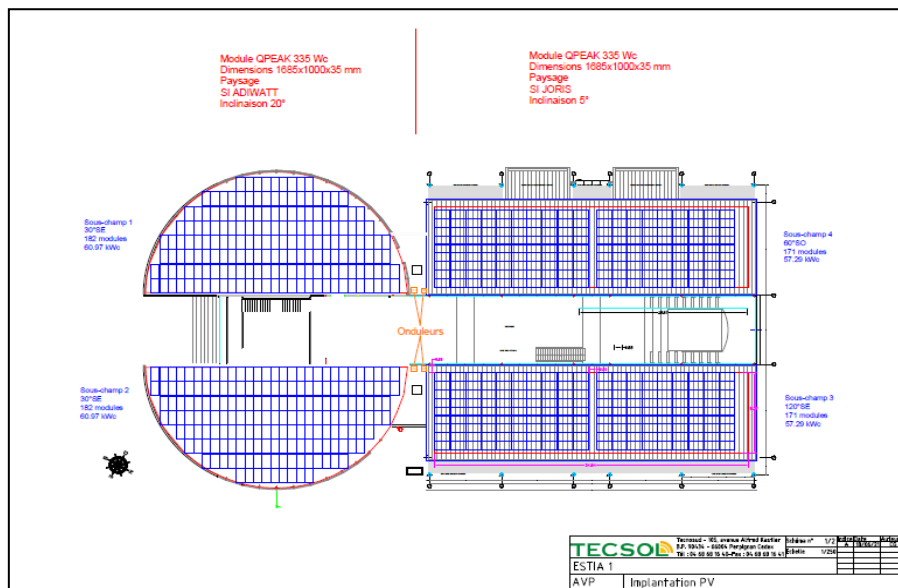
Drawing of the 5,6 kWp PV installation in the ESTIA 1 building.
